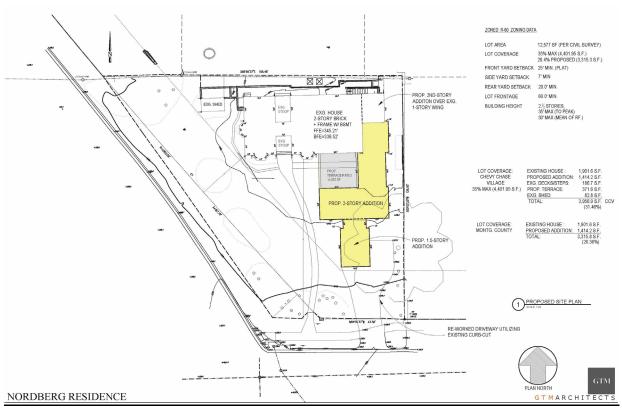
The proposed site plan with the new construction in yellow and patio in gray.
